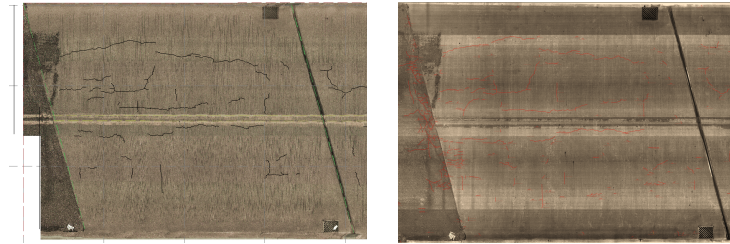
Existing Cracks of Bridge Deck No. 22387- Span 1
